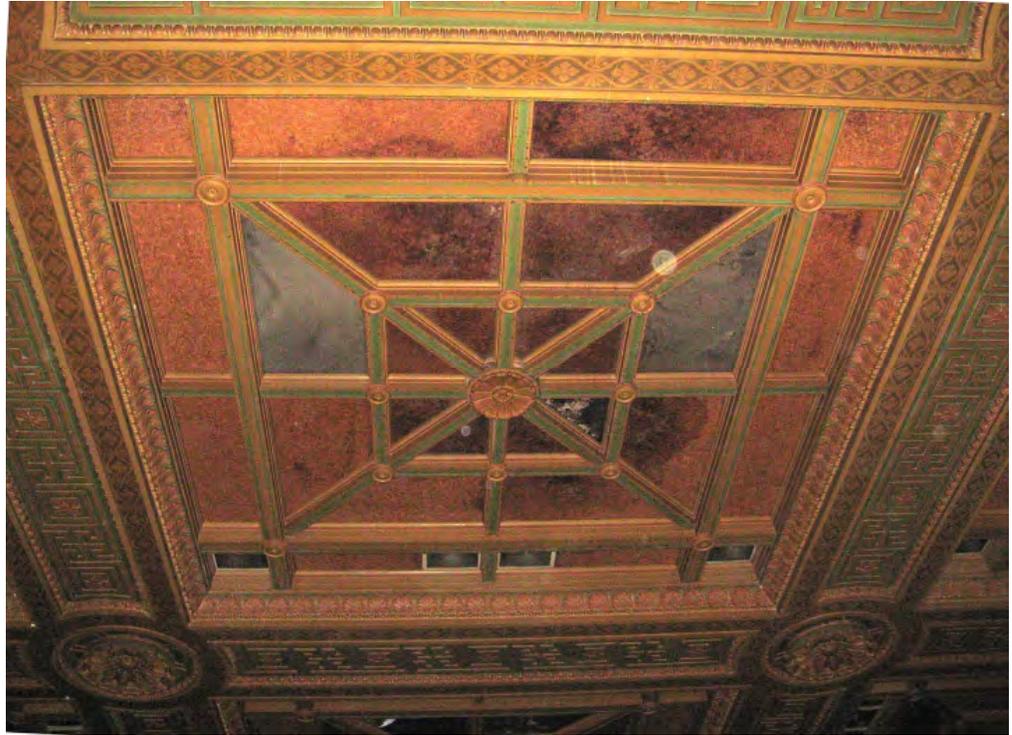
350 Bush St., Exchange Hall ceiling, showing typical panel of historic laylight and surrounding architectural details, including paneled beams with acanthus leaf molding and rosettes.
